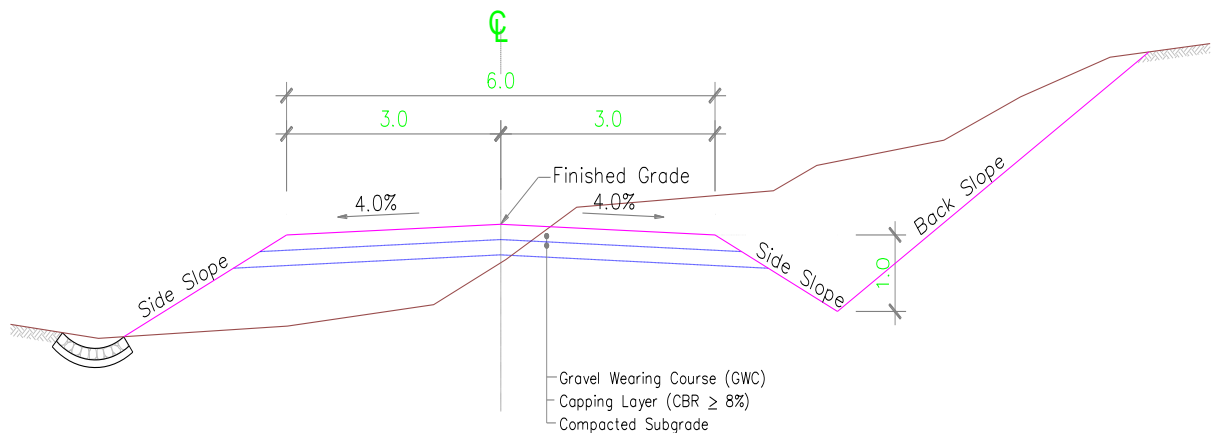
Typical Normal Cut/Fill Rural Road Section with road side designation [ERA DS-6]
